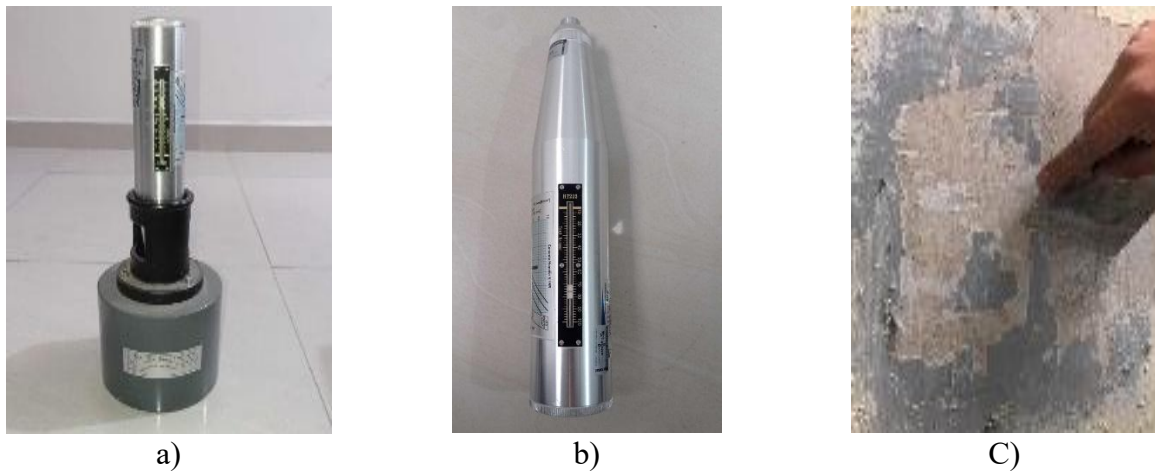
Tool for sclerometer testing; a) calibration of test hammer; b) sclerometer; c) surface cleaning with enamel paint remover.
